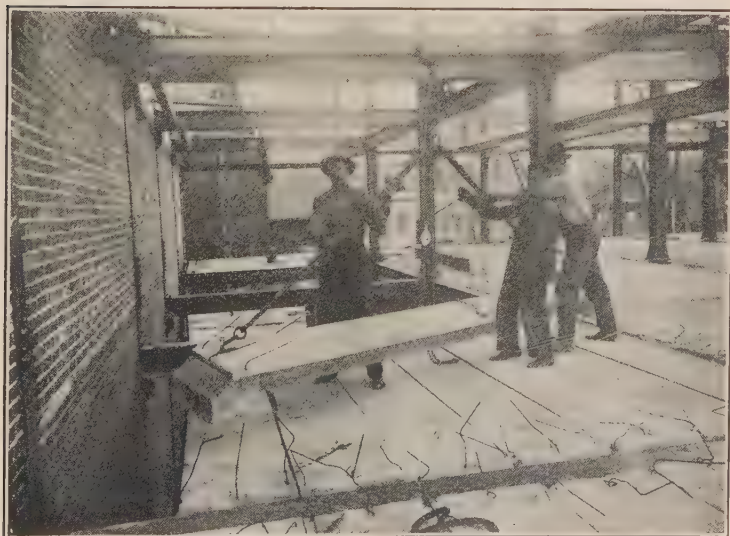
METHOD OF HANDLING FLOOR MEMBERS.
